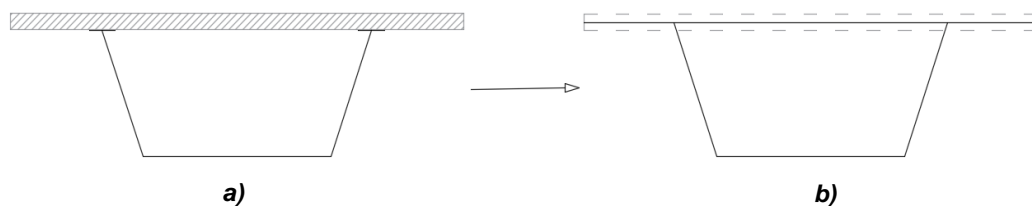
a) Typical cross-section of a steel-concrete composite box girder and b) equivalent homogenised cross-section
